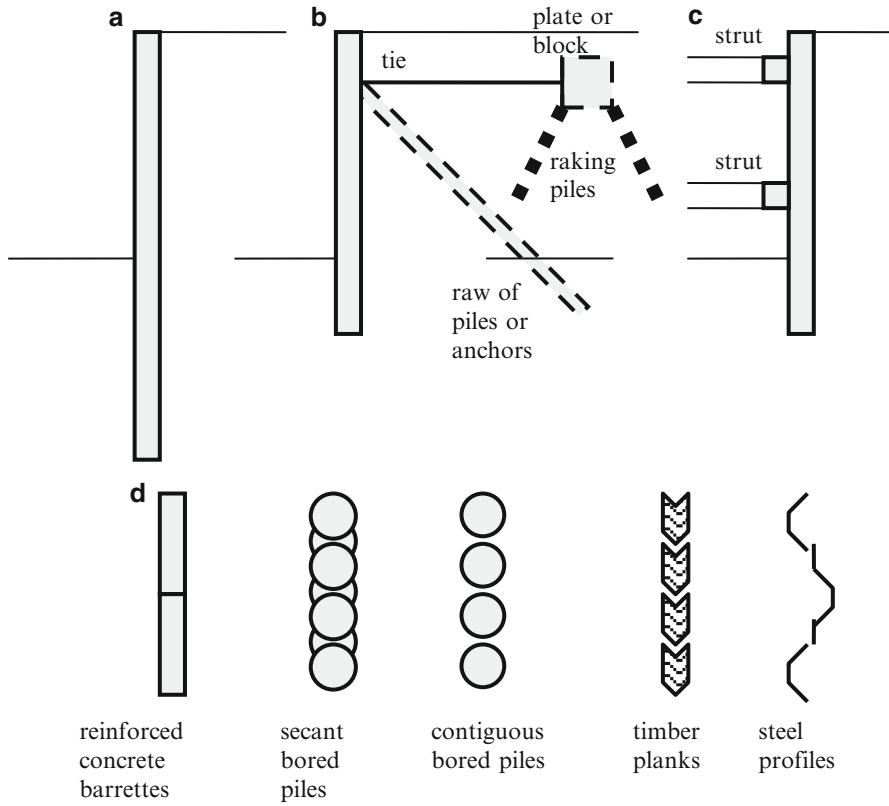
Sections through (a) cantilever, (b) anchored, (c) propped, (d) different materials for slender retaining walls
